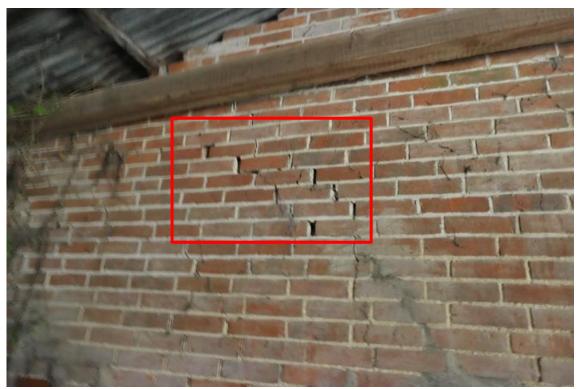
, cracks in brickwork which could offer suitable roosting opportunities, highlighted in red and looking south.
